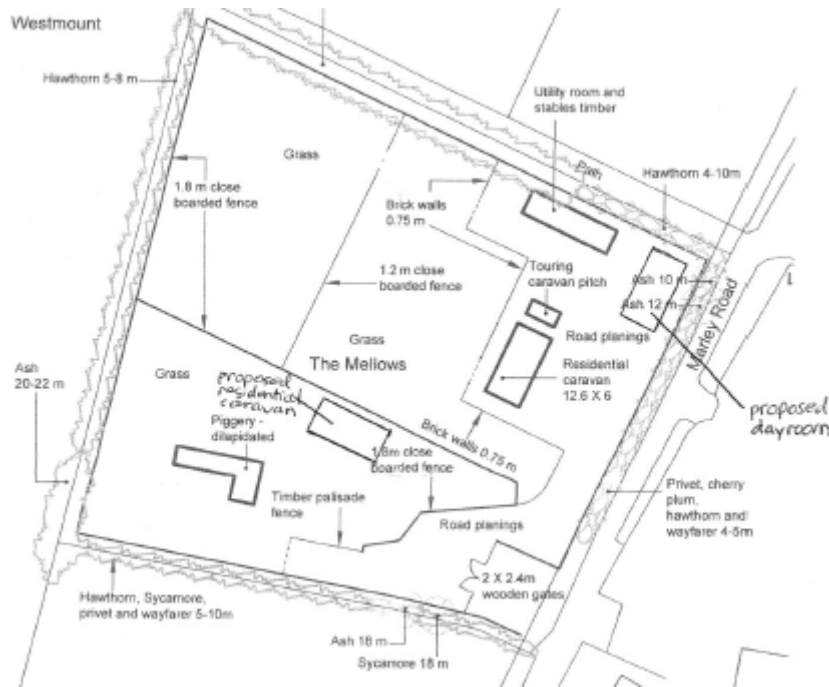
Proposed Site Layout Plan of ref. 14/504218/FULL Additional mobile home and day room and demolition of former piggeries. (approved)
